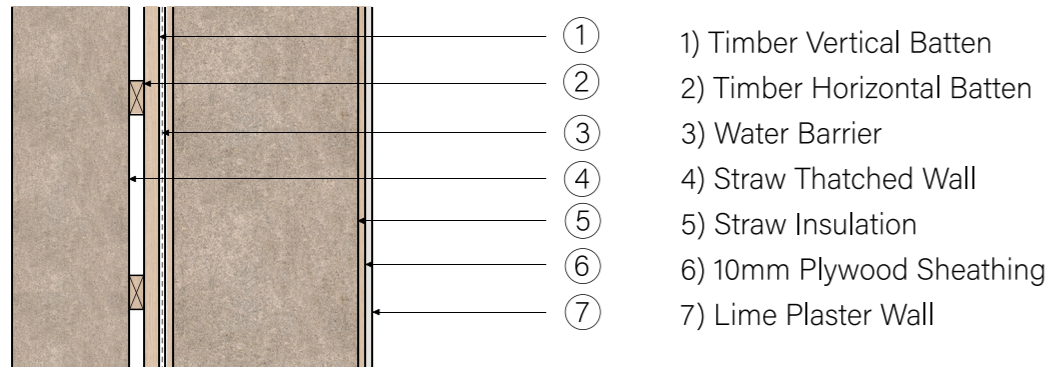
Straw Wall Detail Drawing (Scale 1:200)
